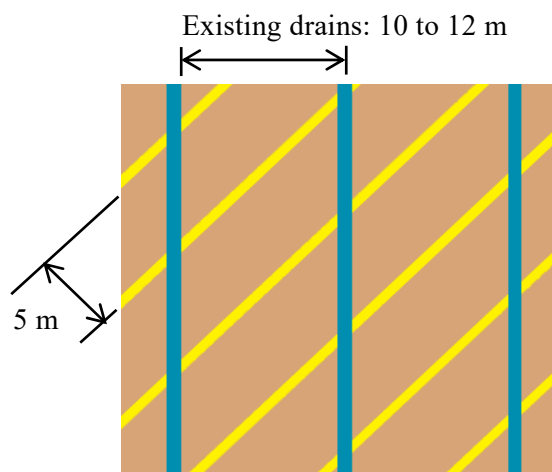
Example 2: Construction of Cut-soiler drains at 45 degrees across the existing drains
